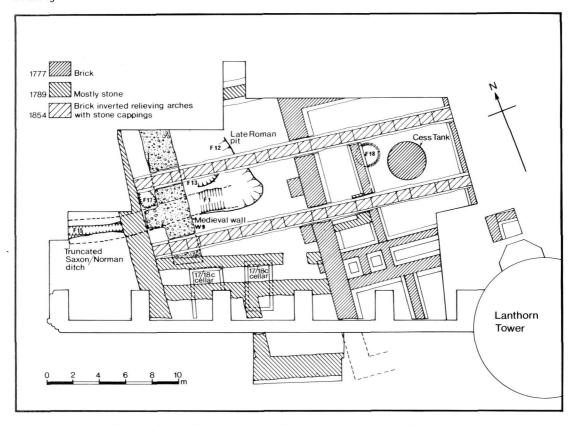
Inmost Ward 1955-77: General plan of excavated features.
